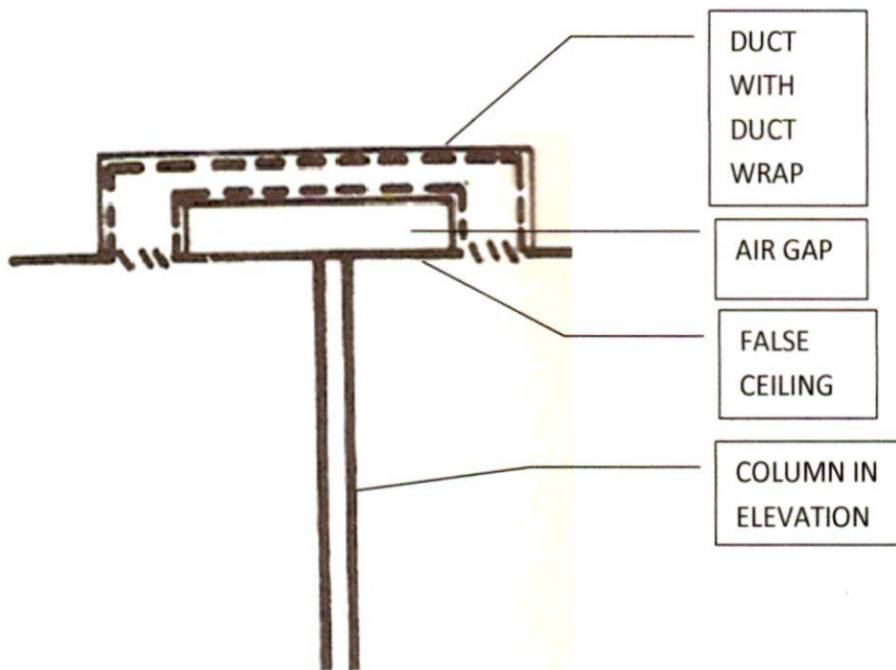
False Ceiling & Ducting System sectional Elevation
